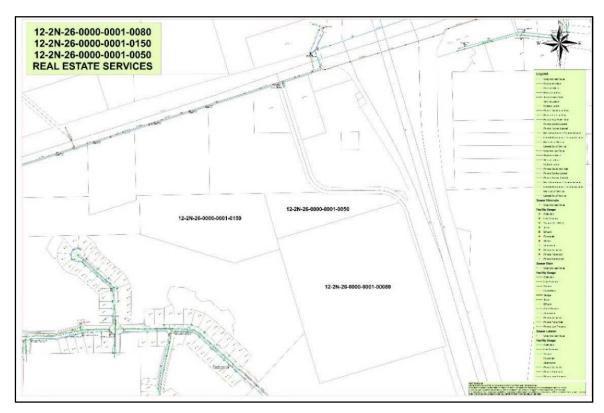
Existing Water & Sanitary Sewer Infrastructure
